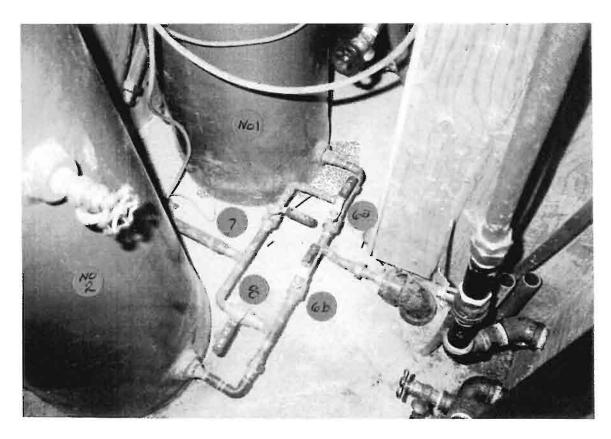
RENOVATED WATER UNIT INLET PIPING
